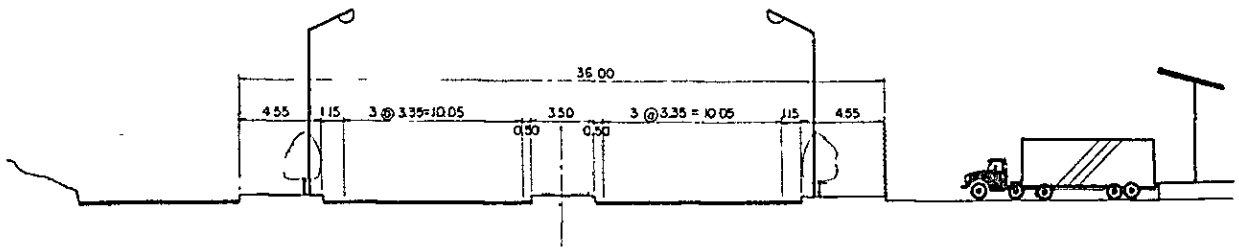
WIDENED CROSS SECTION OF VIA CERRO ANCON(1)
